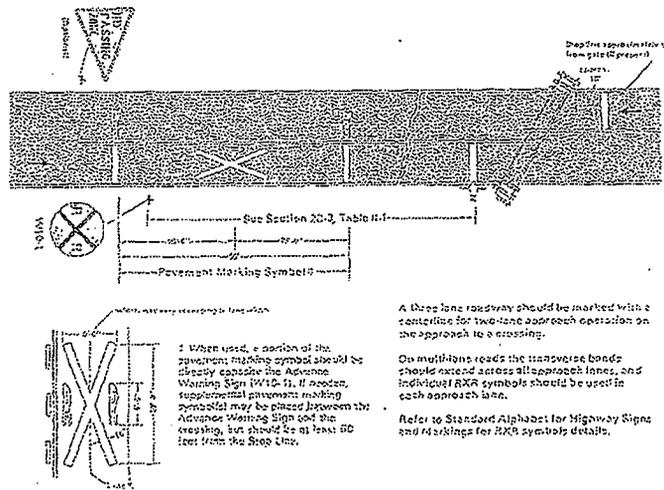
Typical placement of warning signs and pavement markings at railroad highway grade crossings.
